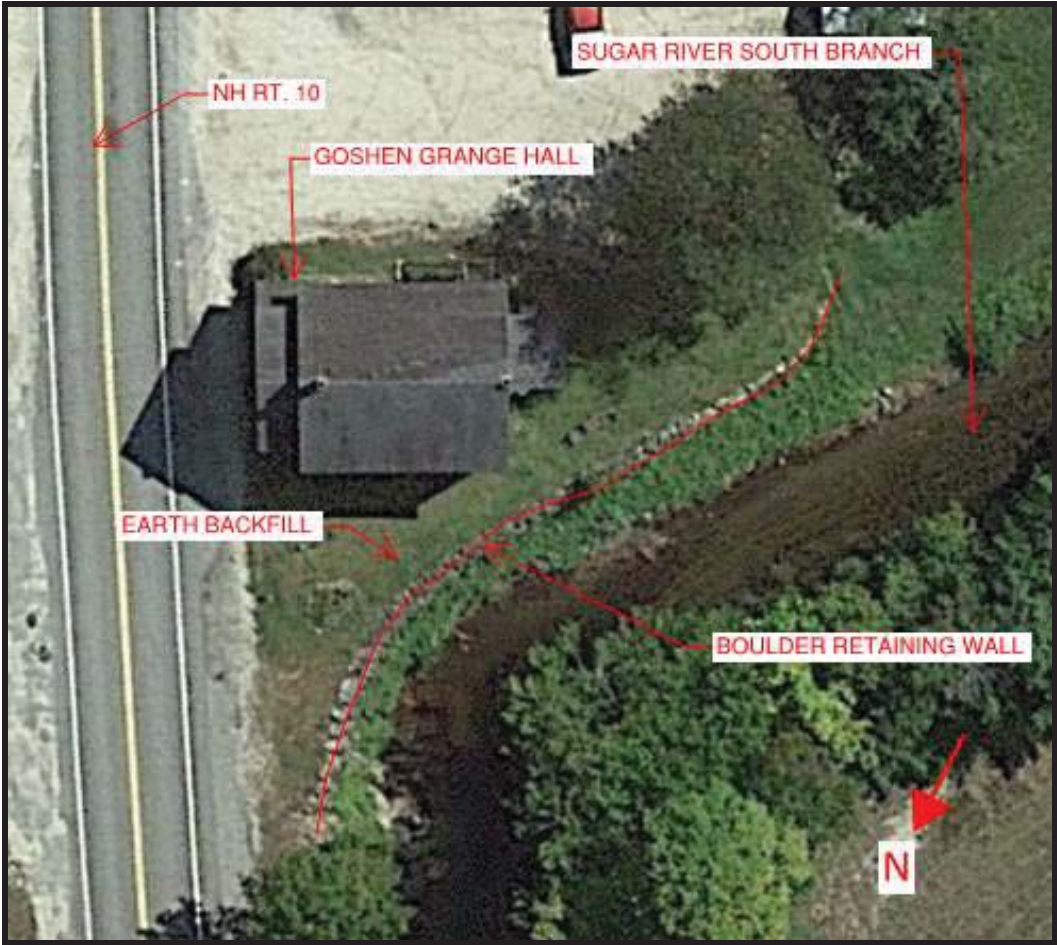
Site plan - note retaining wall with earth backfill, (Ref. Google Earth).
